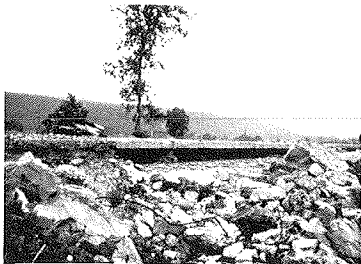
Cracked pier shaft supporting a county bridge on Schrader Branch of Towanda Creek.
